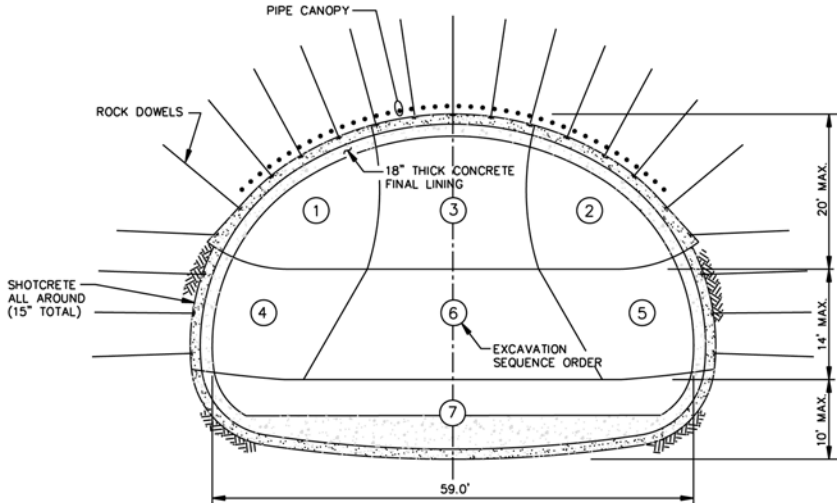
Typical tunnel section for NATM/SEM tunnel alternative
